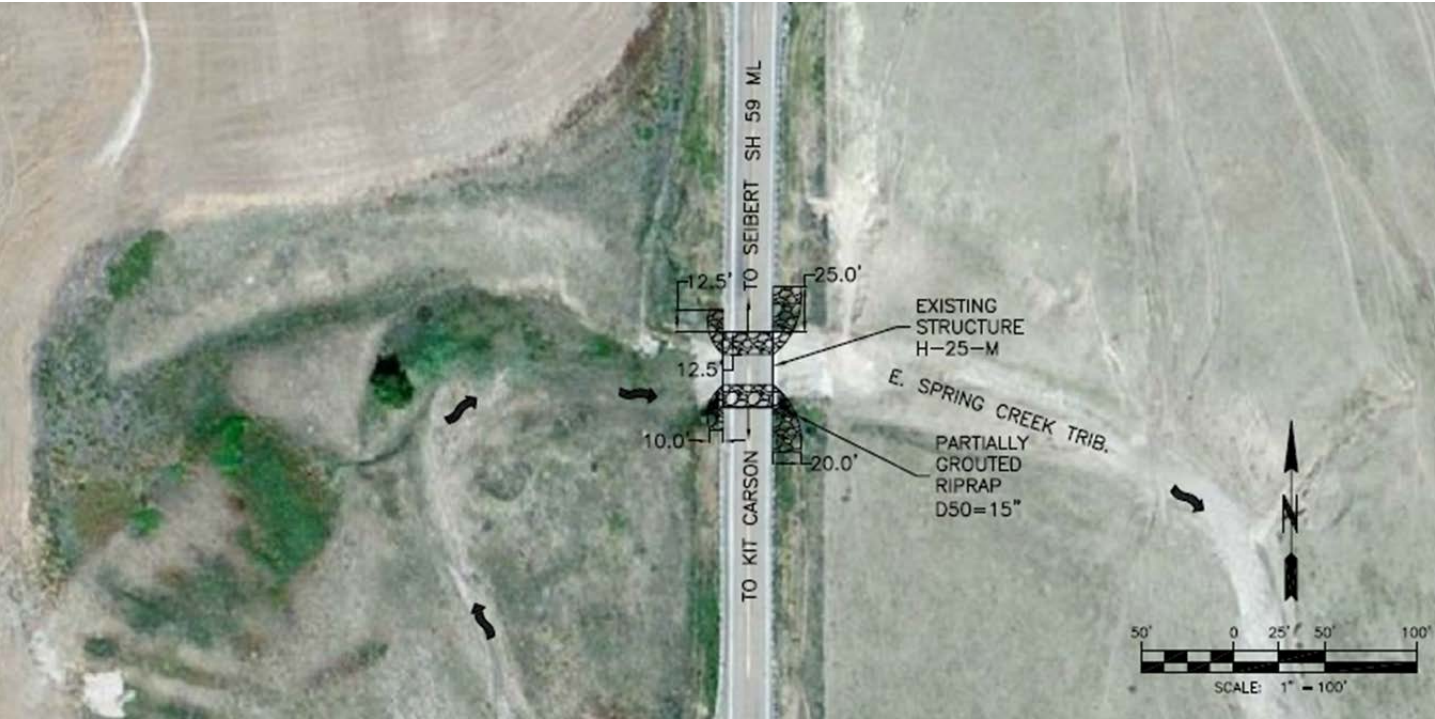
Plan view of Bridge H-25-M with recommended hydraulic scour countermeasure locations
